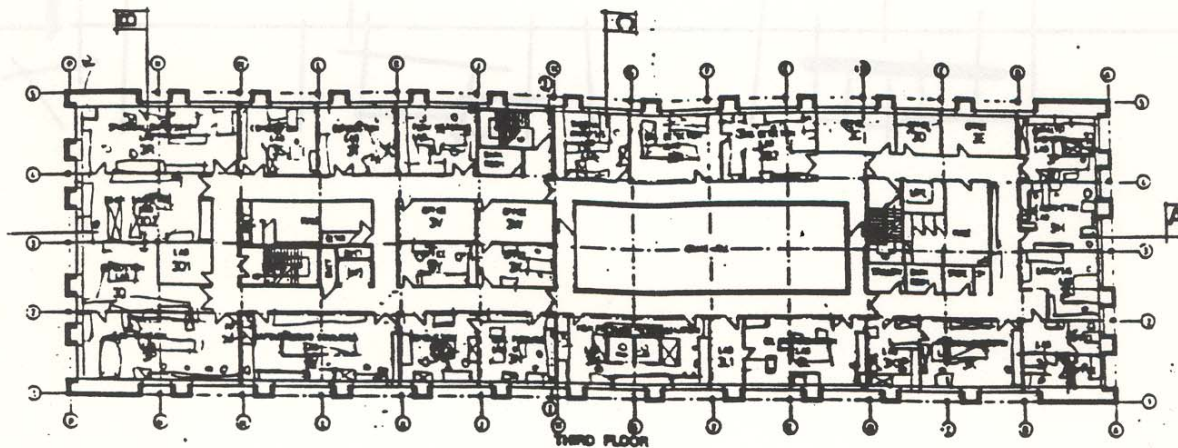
Layout of 3rd floor of British Gas showing the location of large equipment in the centre of laboratory spaces
